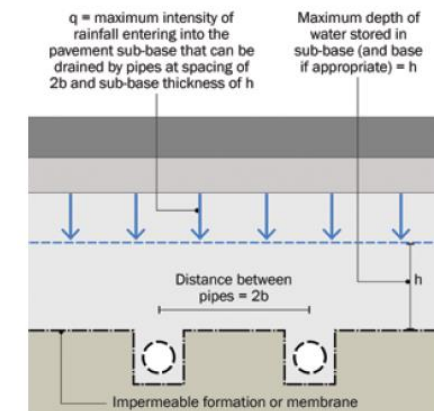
Outfall pipe spacing (after Interpave, 2010)
